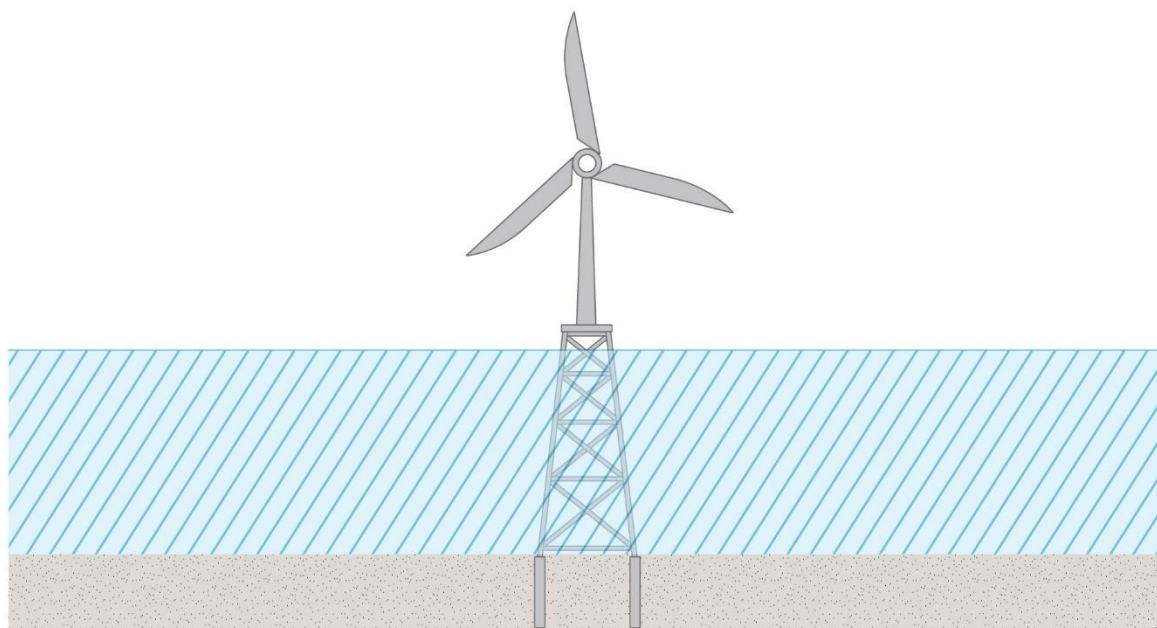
Schematic of a typical pin pile jacket foundation (not to scale)
